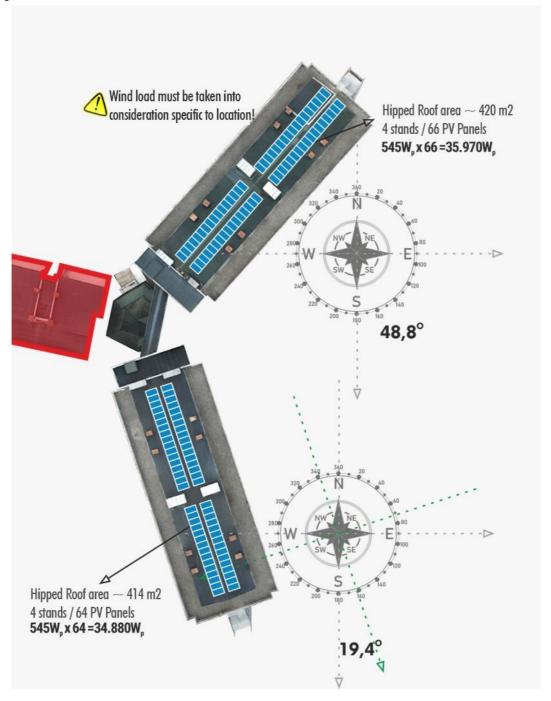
SFL B BLOCK BUILDING ROOF TOP PV LAYOUT PLAN
